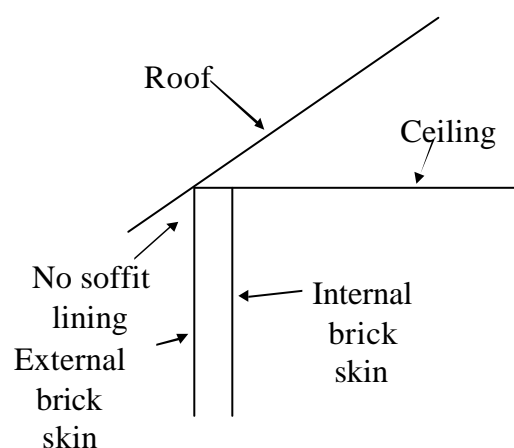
Illustration of a vulnerable unreinforced masonry building detail whereby the roof is solely supported on the external brick skin
